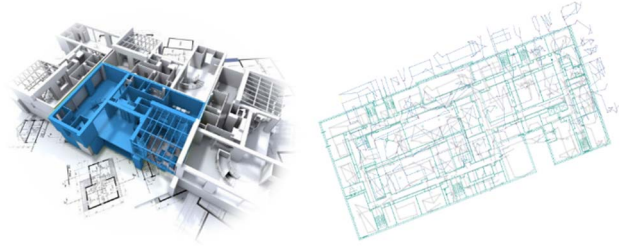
Building Information Model. The floor plan from BIM is used to create set of navigable paths in that building environment.
